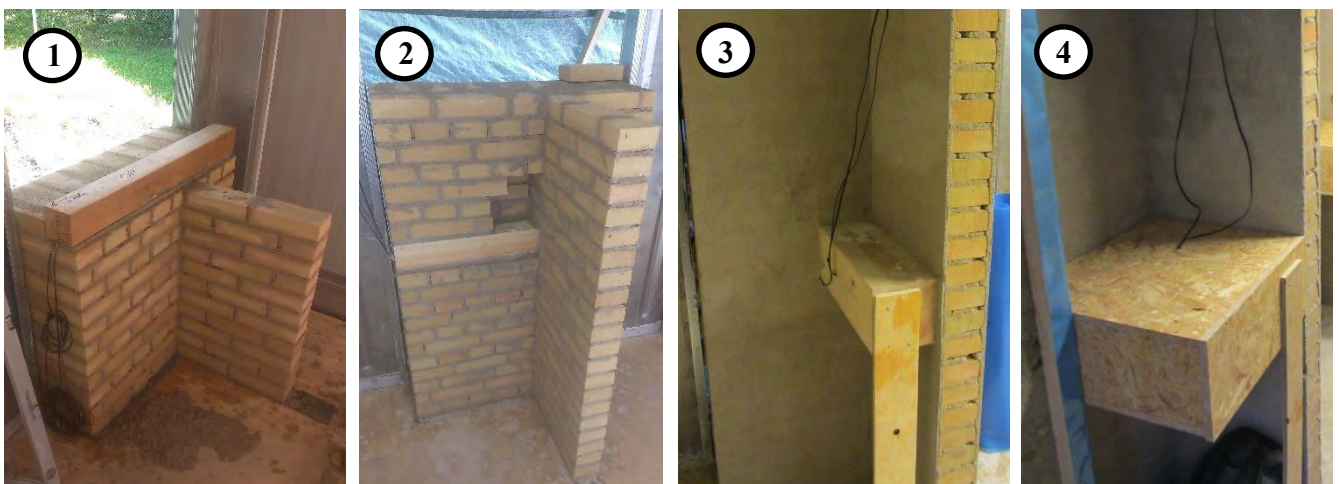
Masonry assembly build-up. 1) Installation of embedded wooden wall plate. 2) Bare masonry wall with hole for the embedded part of the wooden beam. 3) Rendered masonry wall with embedded wooden beam. 4) Finished wooden floor structure with OSB boards on top, bottom and sides.
